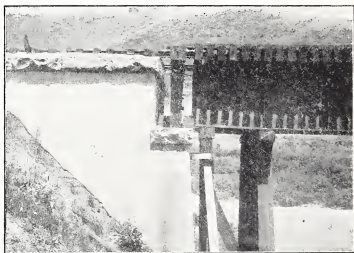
West Abutment, Pájaro River Bridge, Southern Pacific Railroad.
